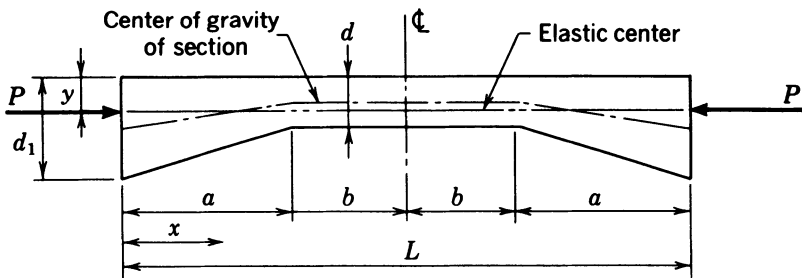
Haunched beam of rectangular cross section prestressed with a straight tendon.
